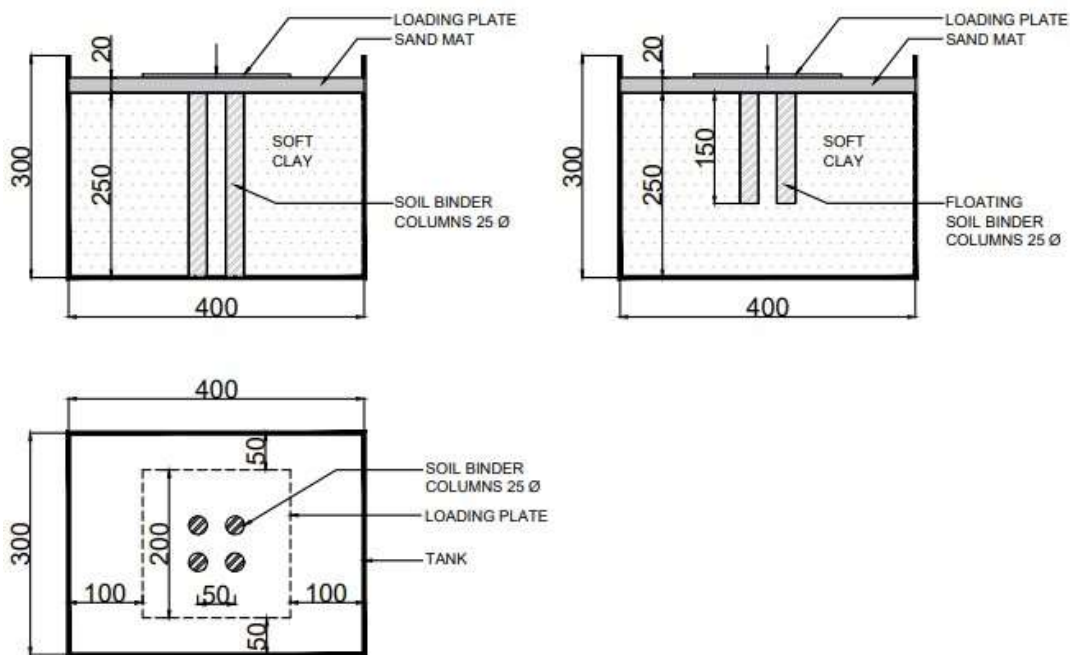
Test details on the improved soft clay bed with 2x2 group columns (a) Section – end bearing column (b) Section – floating column (c) Elevation – All dimensions in mm
